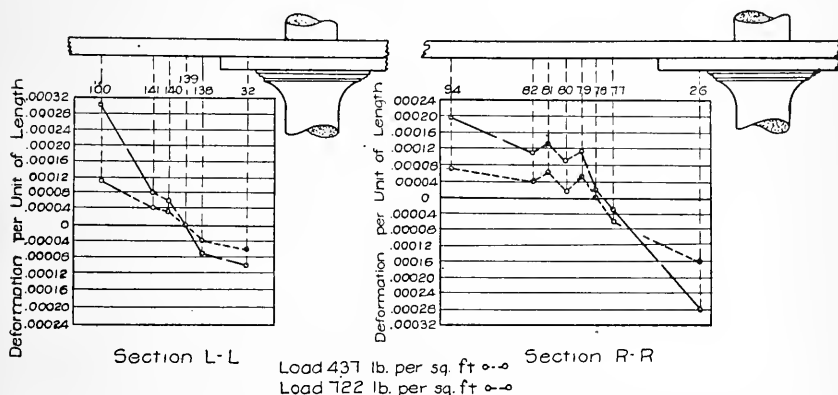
LOCATION OF POINTS OF ZERO UNIT-DEFORMATION ON UNDER SURFACE OF TEST FLOOR OF SCHULTZE BAKING COMPANY BUILDING.
